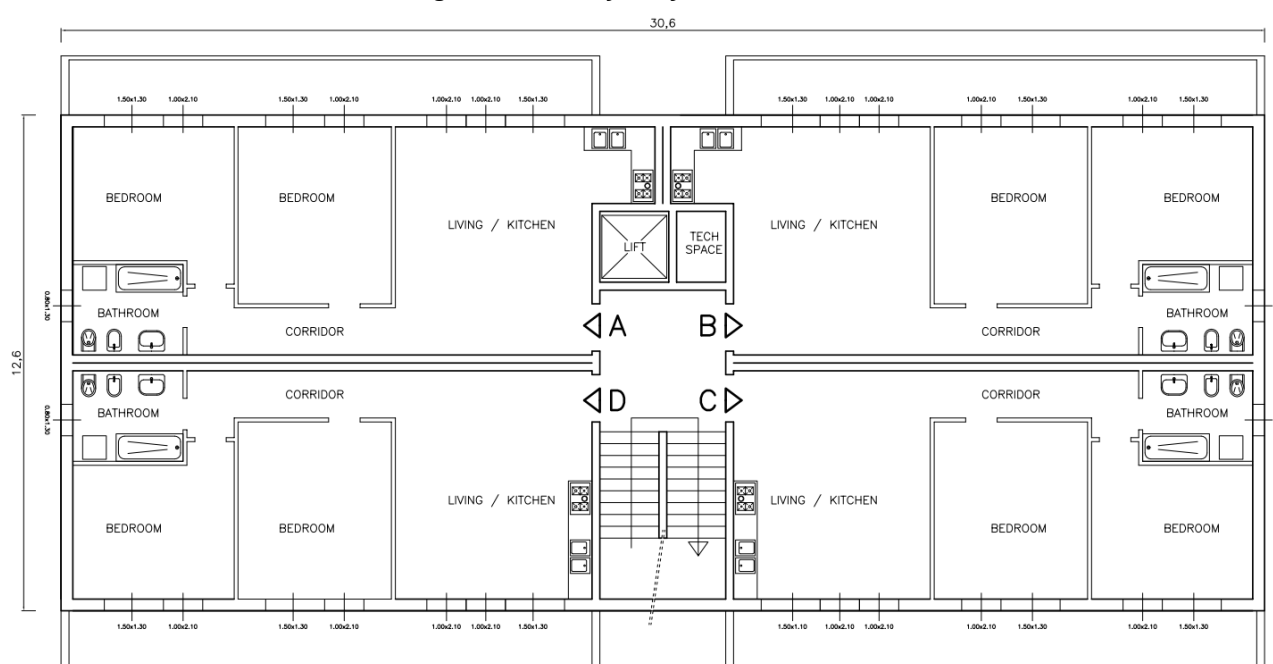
Multi-family house, typical layout of a floor with the 4 apartments
